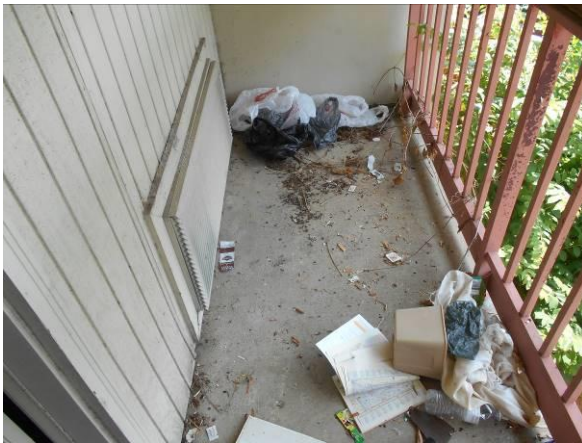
View of the exterior porch with an individual wall mounted HVAC unit.
